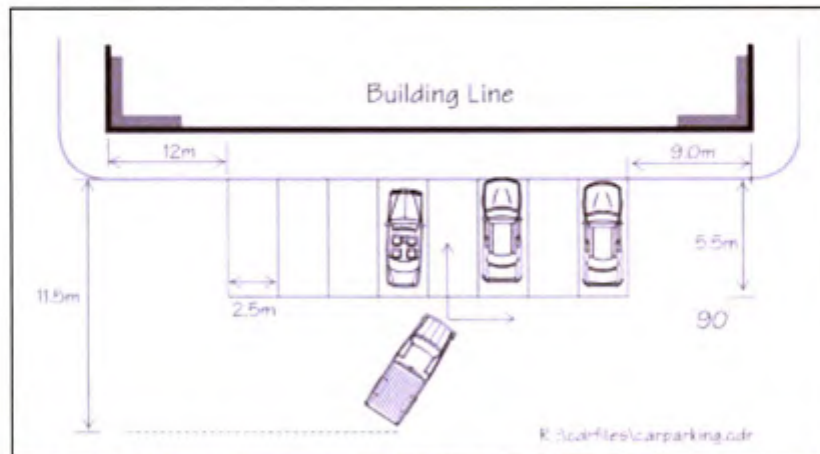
Northern Territory Planning Scheme - Parking Dimensions
